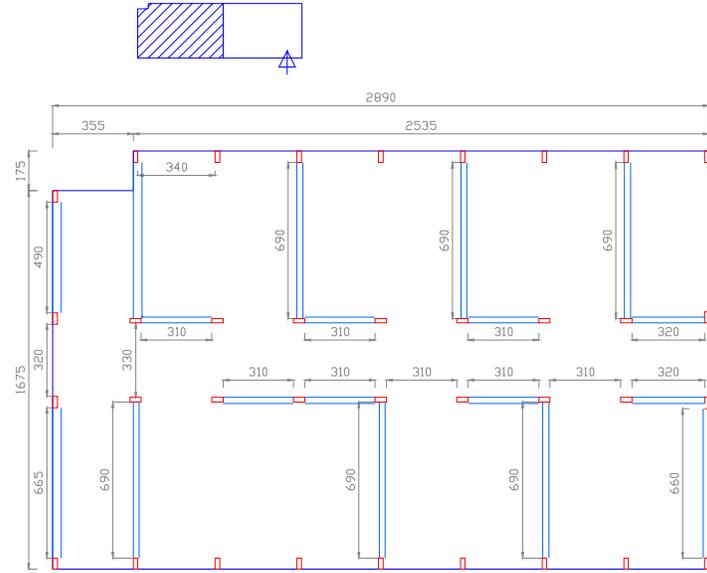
The floor plan for C-12-02. The structural system is a moment-resisting frame. The columns are 0.2m x 0.5m. The school building comprises two independent structures separated by an insufficient expansion joint. Only the shaded part in the upper figure was surveyed. The arrow indicates the entrance to the building. The dimensions are in cm.
